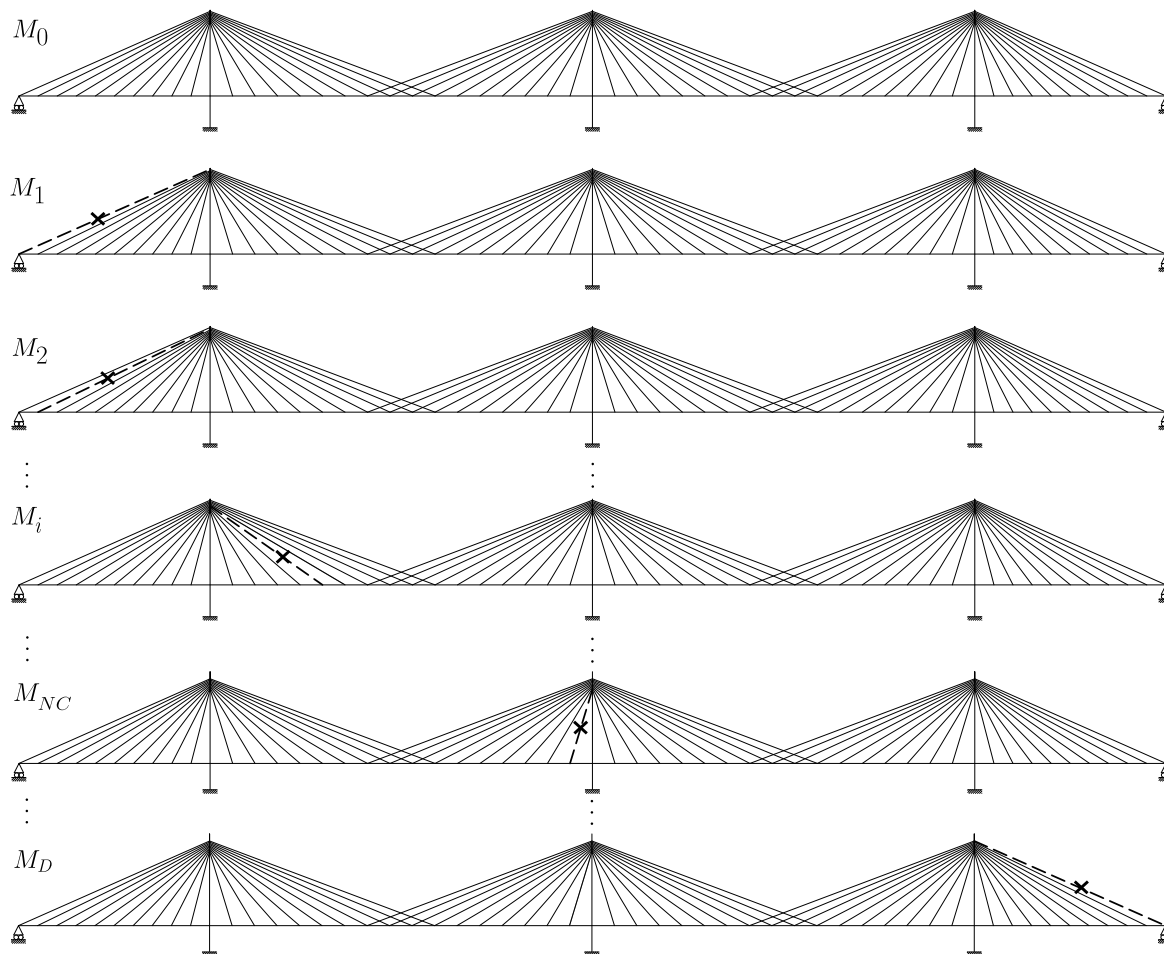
Intact and damaged configurations in a generic cable-stayed bridge.
